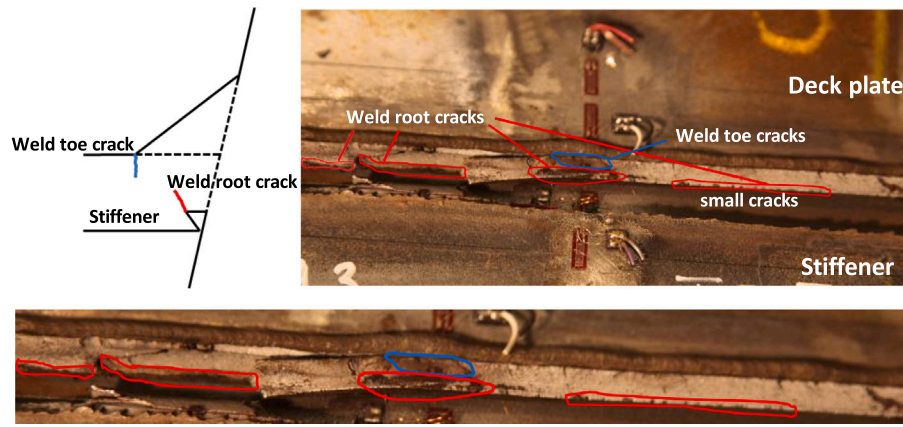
Fracture surface of the specimen S2T3.
